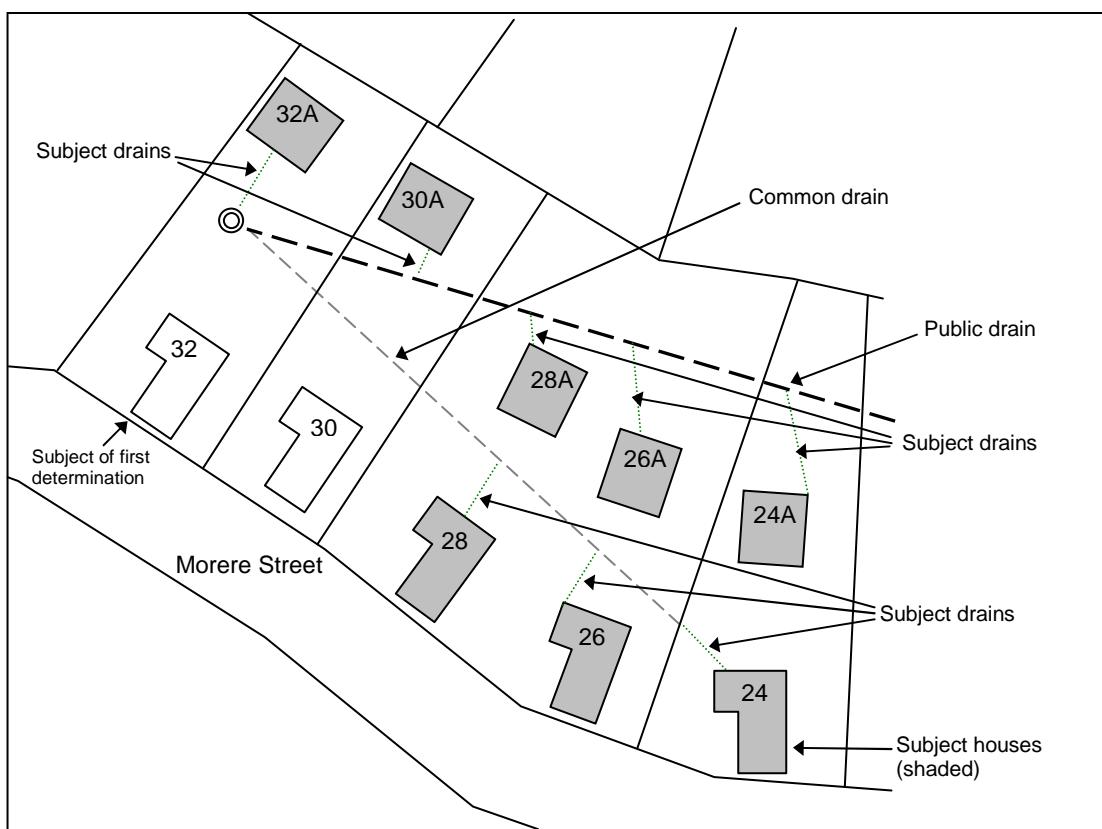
Schematic site plan showing the houses and the common drain (not to scale)
